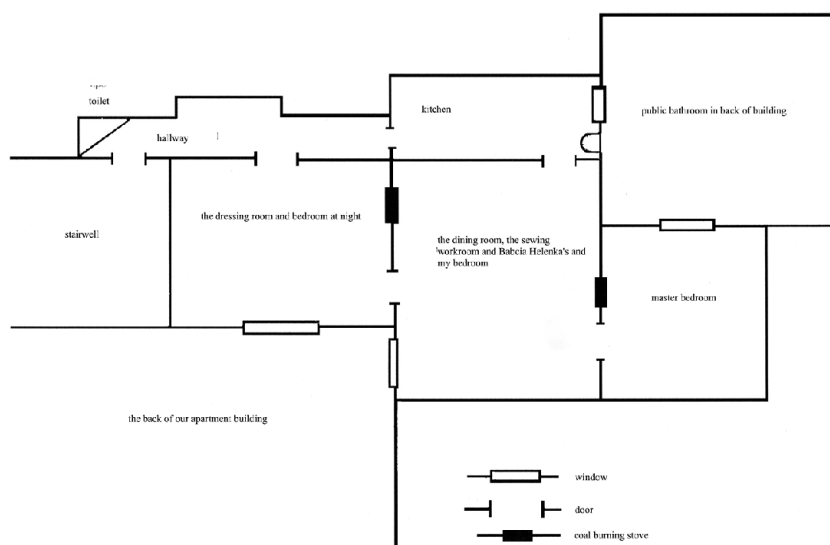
The layout of my parents' apartment on 6 Karmelicka Street, number 23, second story, back of the building.
